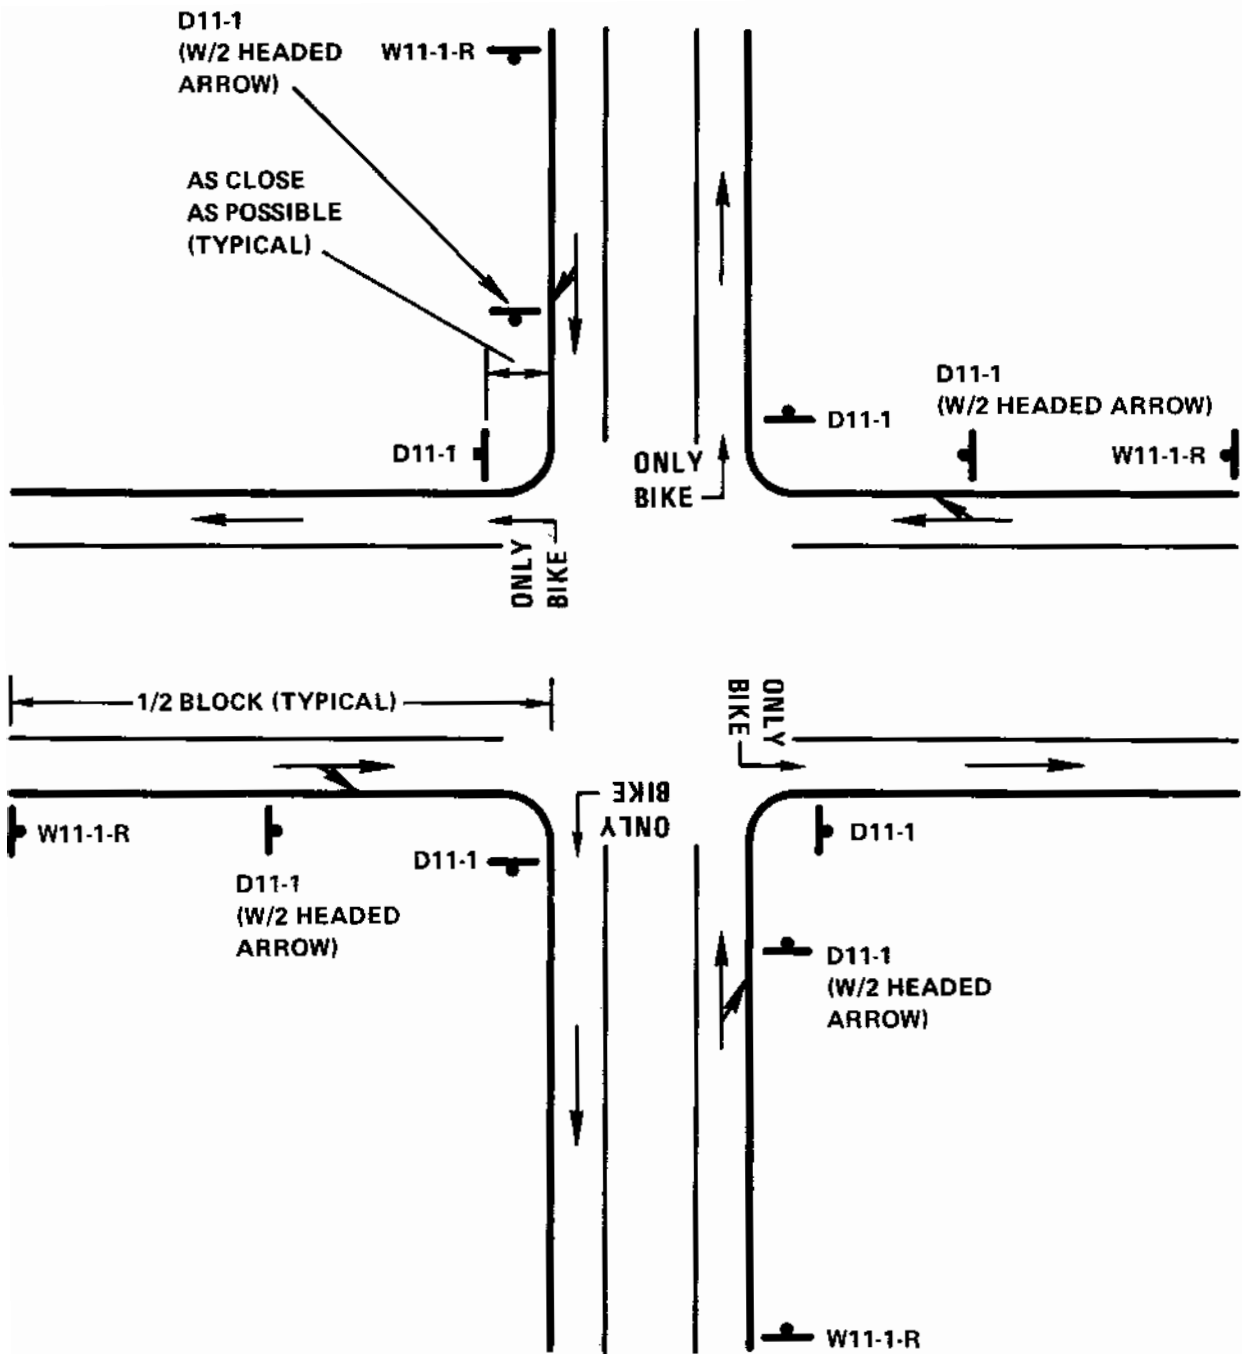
Intersection Signing Plan: Two Class II Bikeways Cross at a Road Intersection
